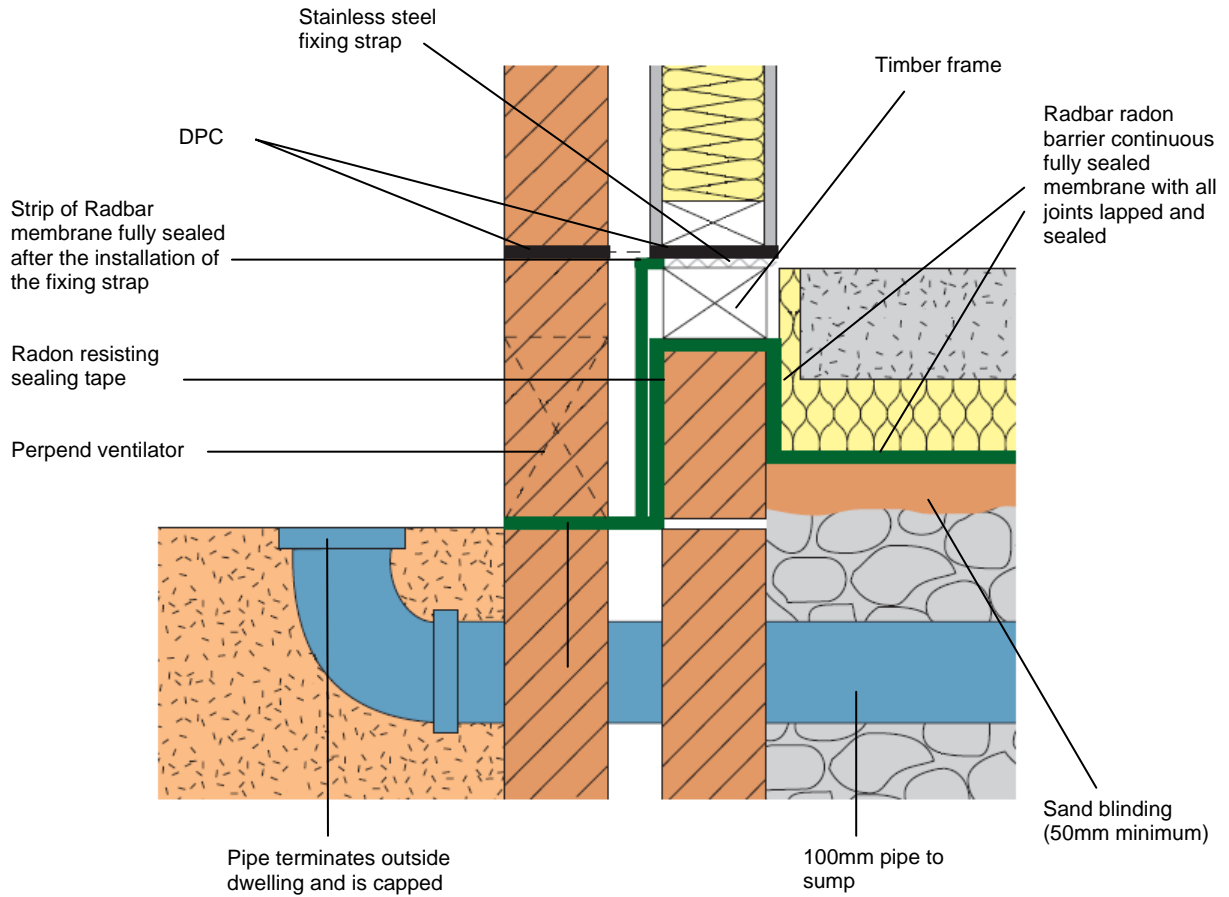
Detail showing Radbar under floating slab with collection sump and vent pipe
